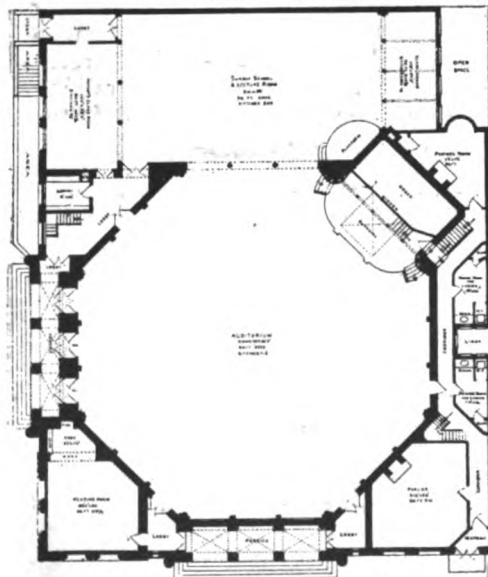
FIRST PRESBYTERIAN CHURCH, QUINCY, MASS. RECTANGULAR AUDIENCE HALL PLAN, CORNER PULPIT.
